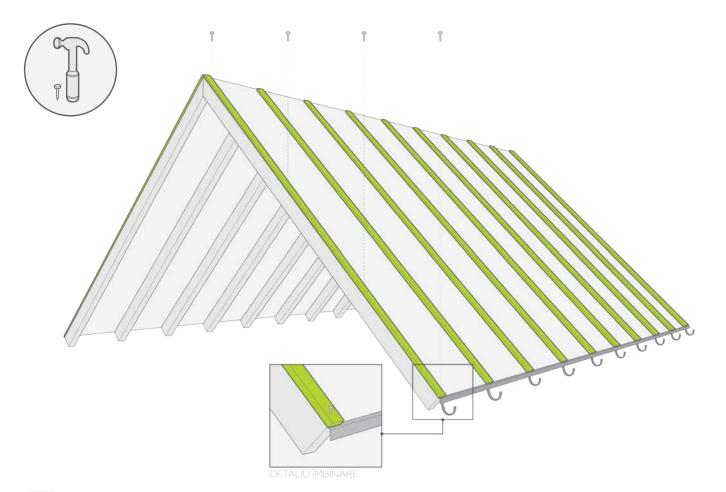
INSTALLING OF THE VERTICAL BATTENS - BOUND DETAIL
